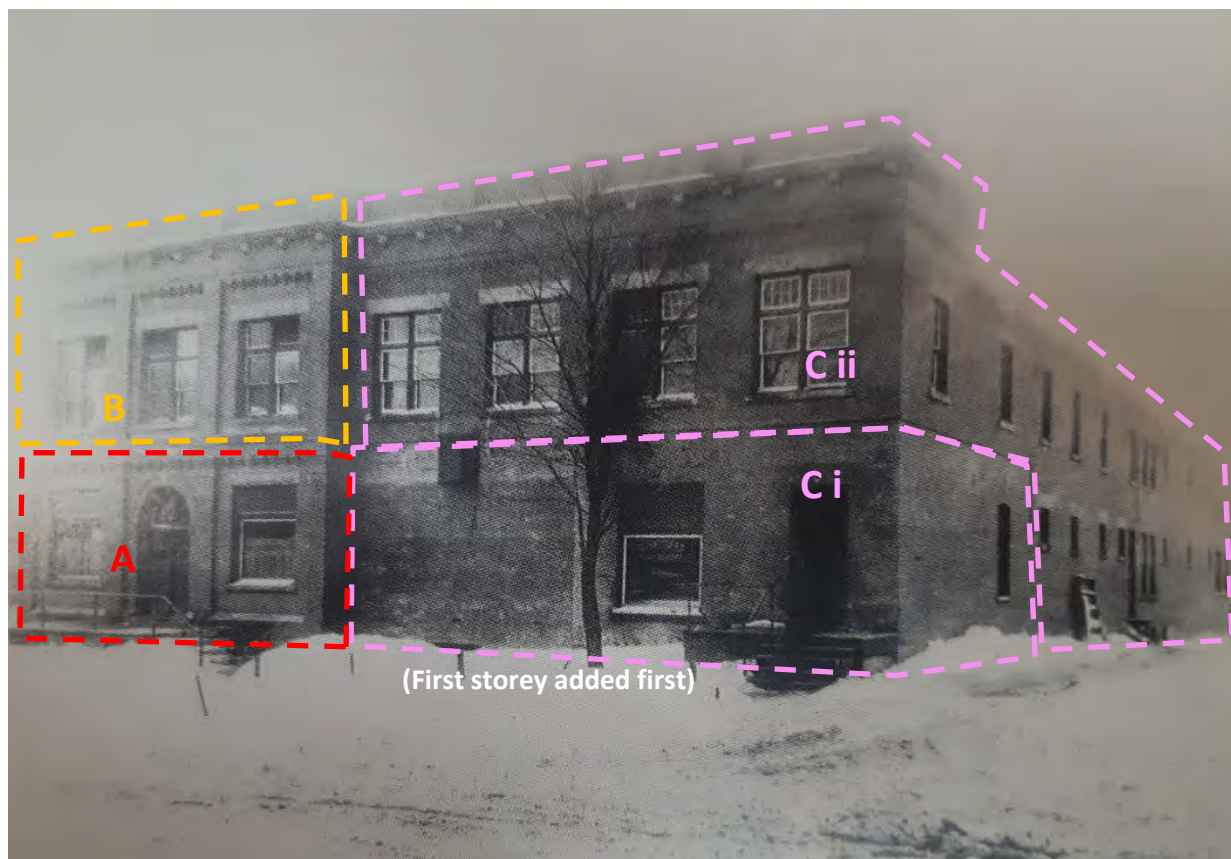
Photograph of the J.M. Schneider factory additions constructed following the removal of the original J.M. Schneider dwelling/factory, n.d. This photograph notes the location of Sections "A", "B", and "C i" and "Cii" (Source: J.M. Schneider Inc., 1990)
